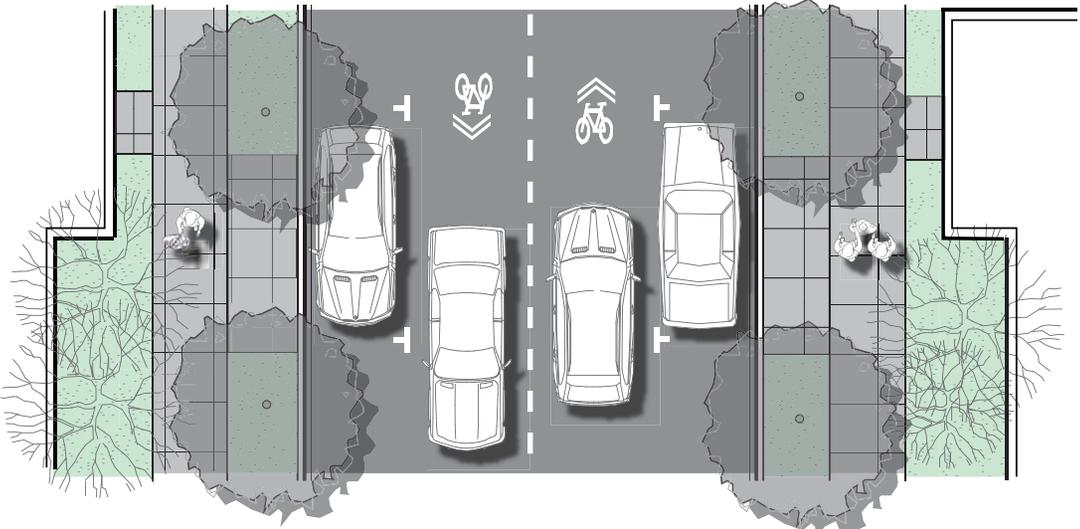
Section 6b: South 'A' Street looking south in the Lark District
